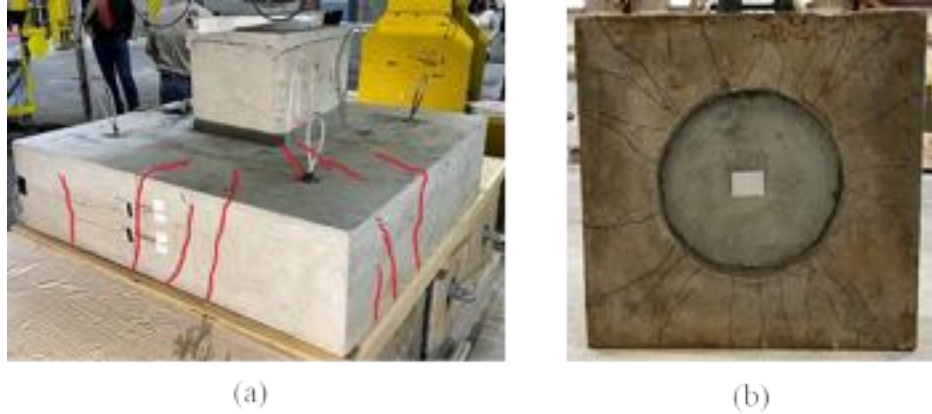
Cracking on (a) cap and (b) bottom of specimen SC-1
